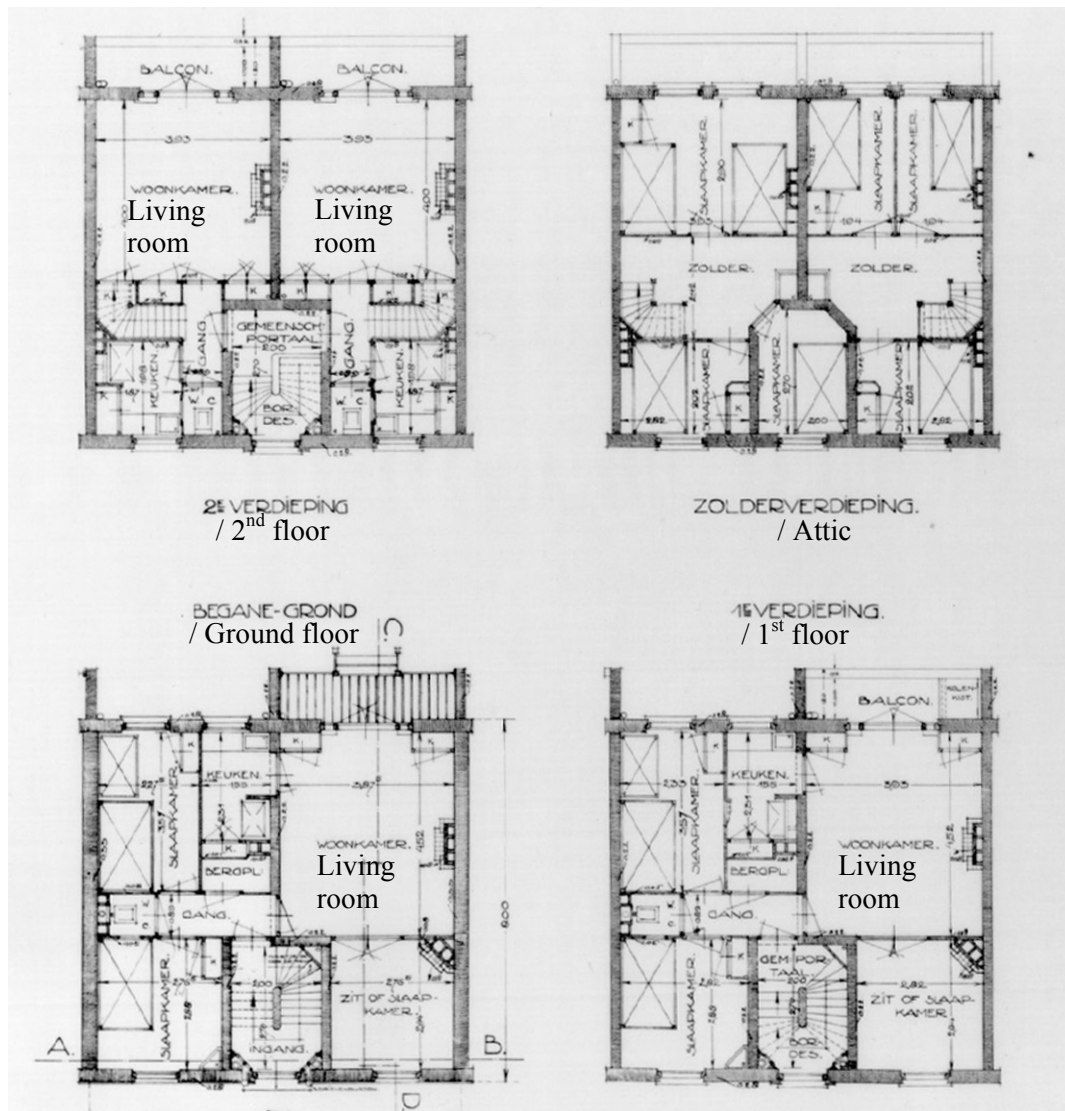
Spangen Housing State: Block VIII and IX, Rotterdam, 1919, plan layout
